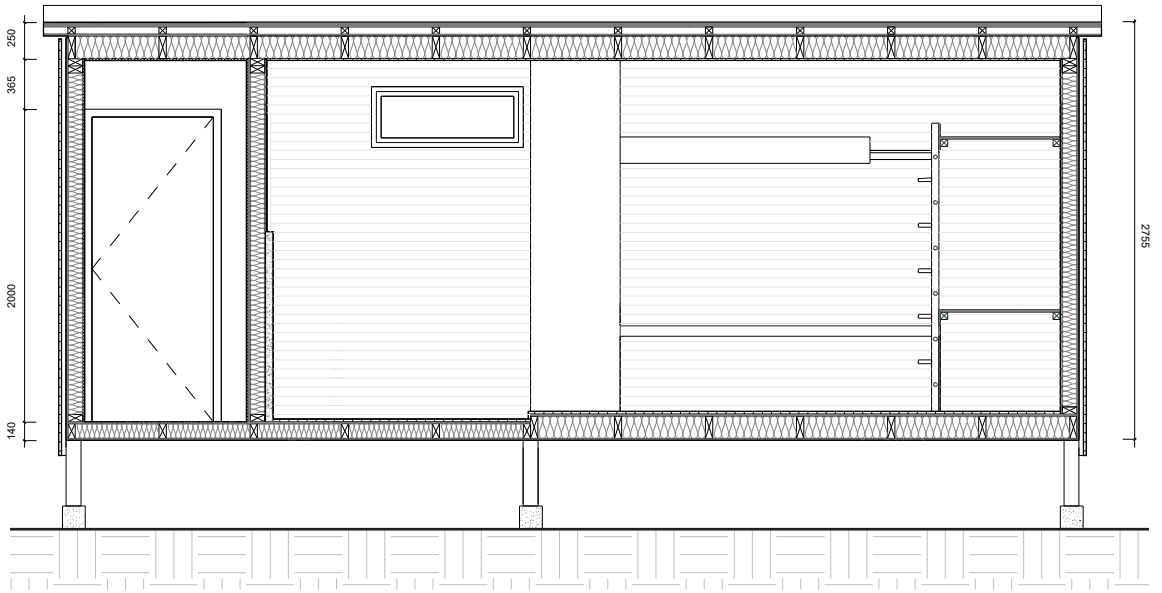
SECTION A-A OF THE BUILT CABIN. SCALE 1:50
